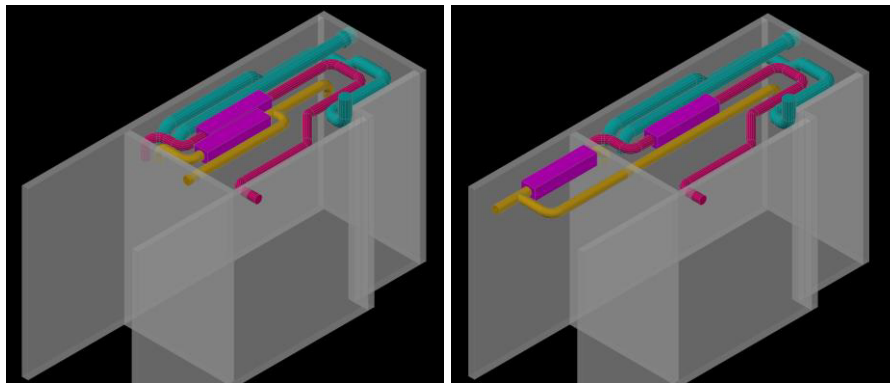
Ventilation ducts in suspended ceiling of bathroom and adjacent hall. Designers solution 6a on the left and installers solution 6b on the right.
